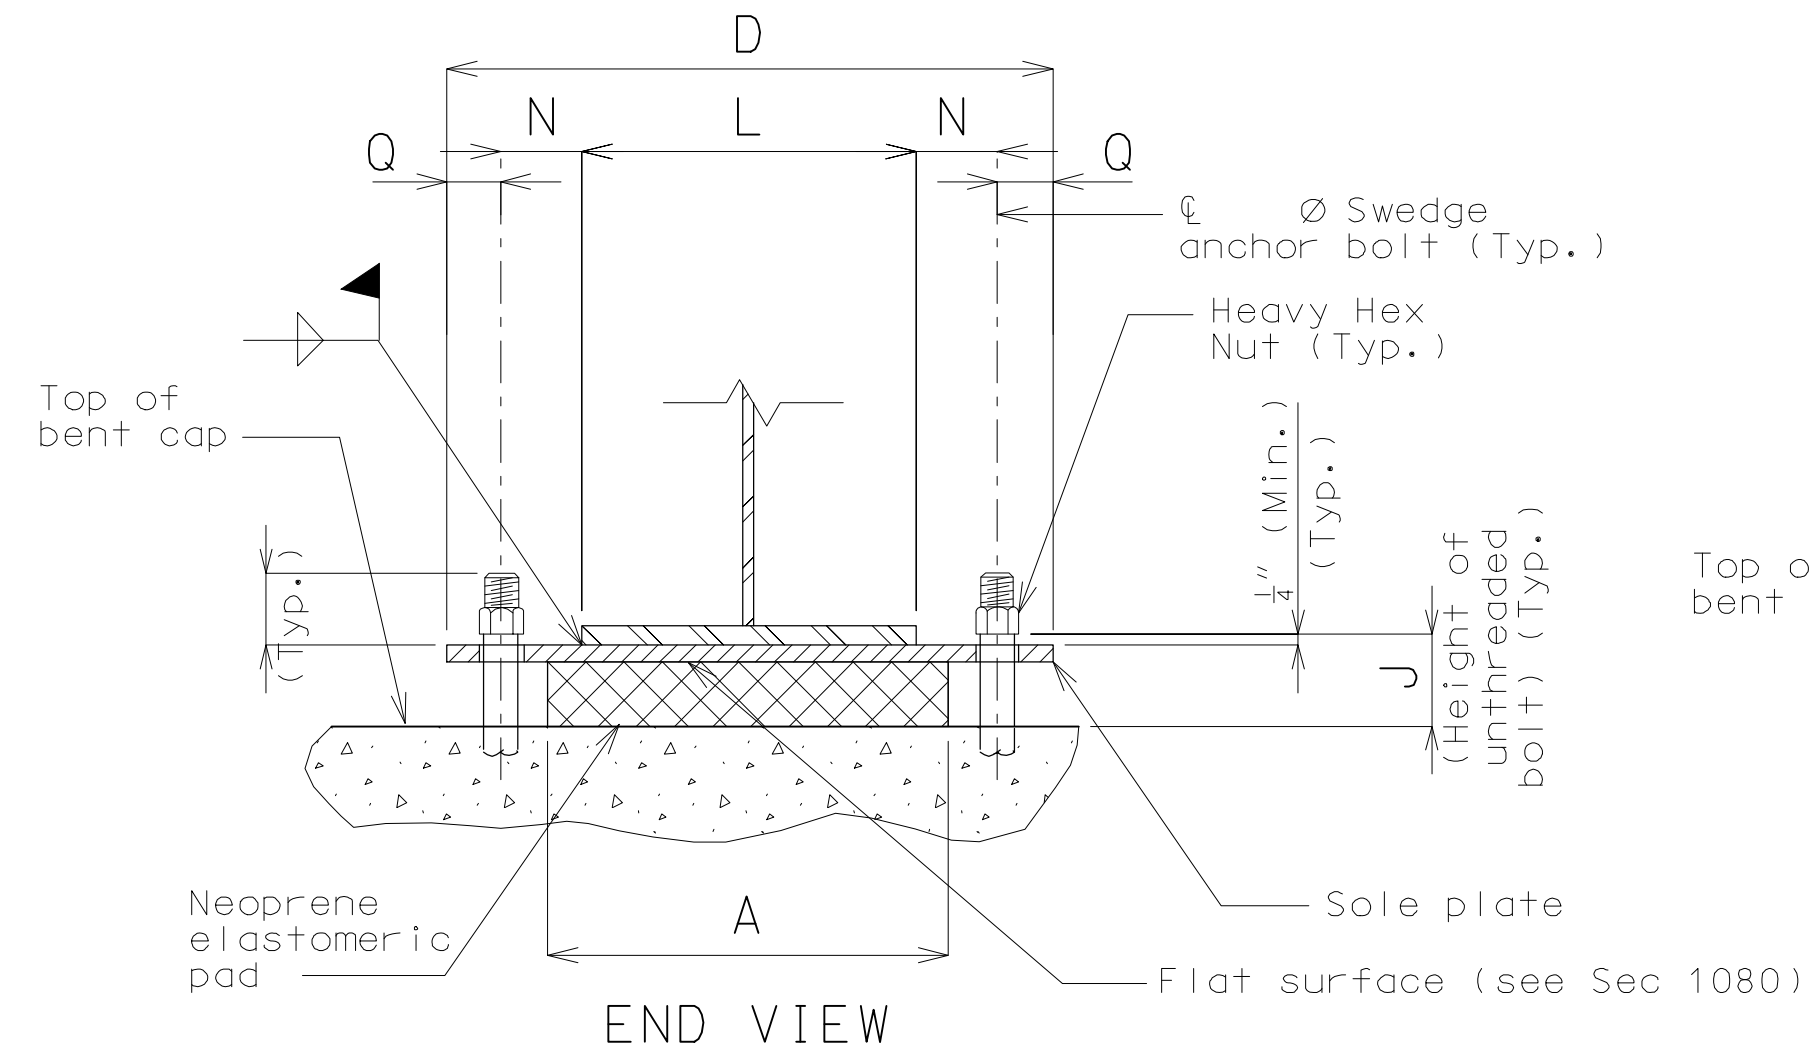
/4" Ø THRU 2 1/2" Ø ANCHOR BOLTS
